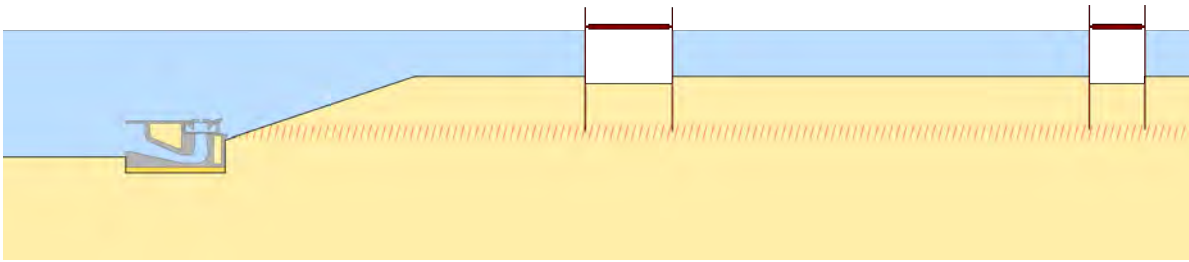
Excavation of cofferdam to NAP - 10.5 m
